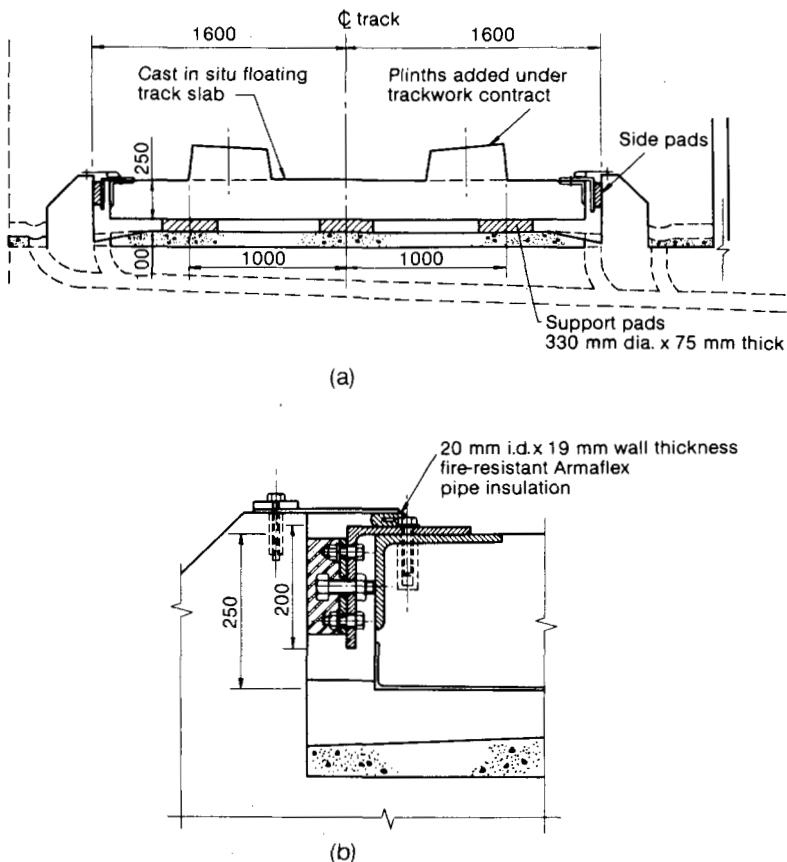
Floating track slab (dimensions in millimetres): (a) section through slab; (b) detail of edge seal and side pad fixing
